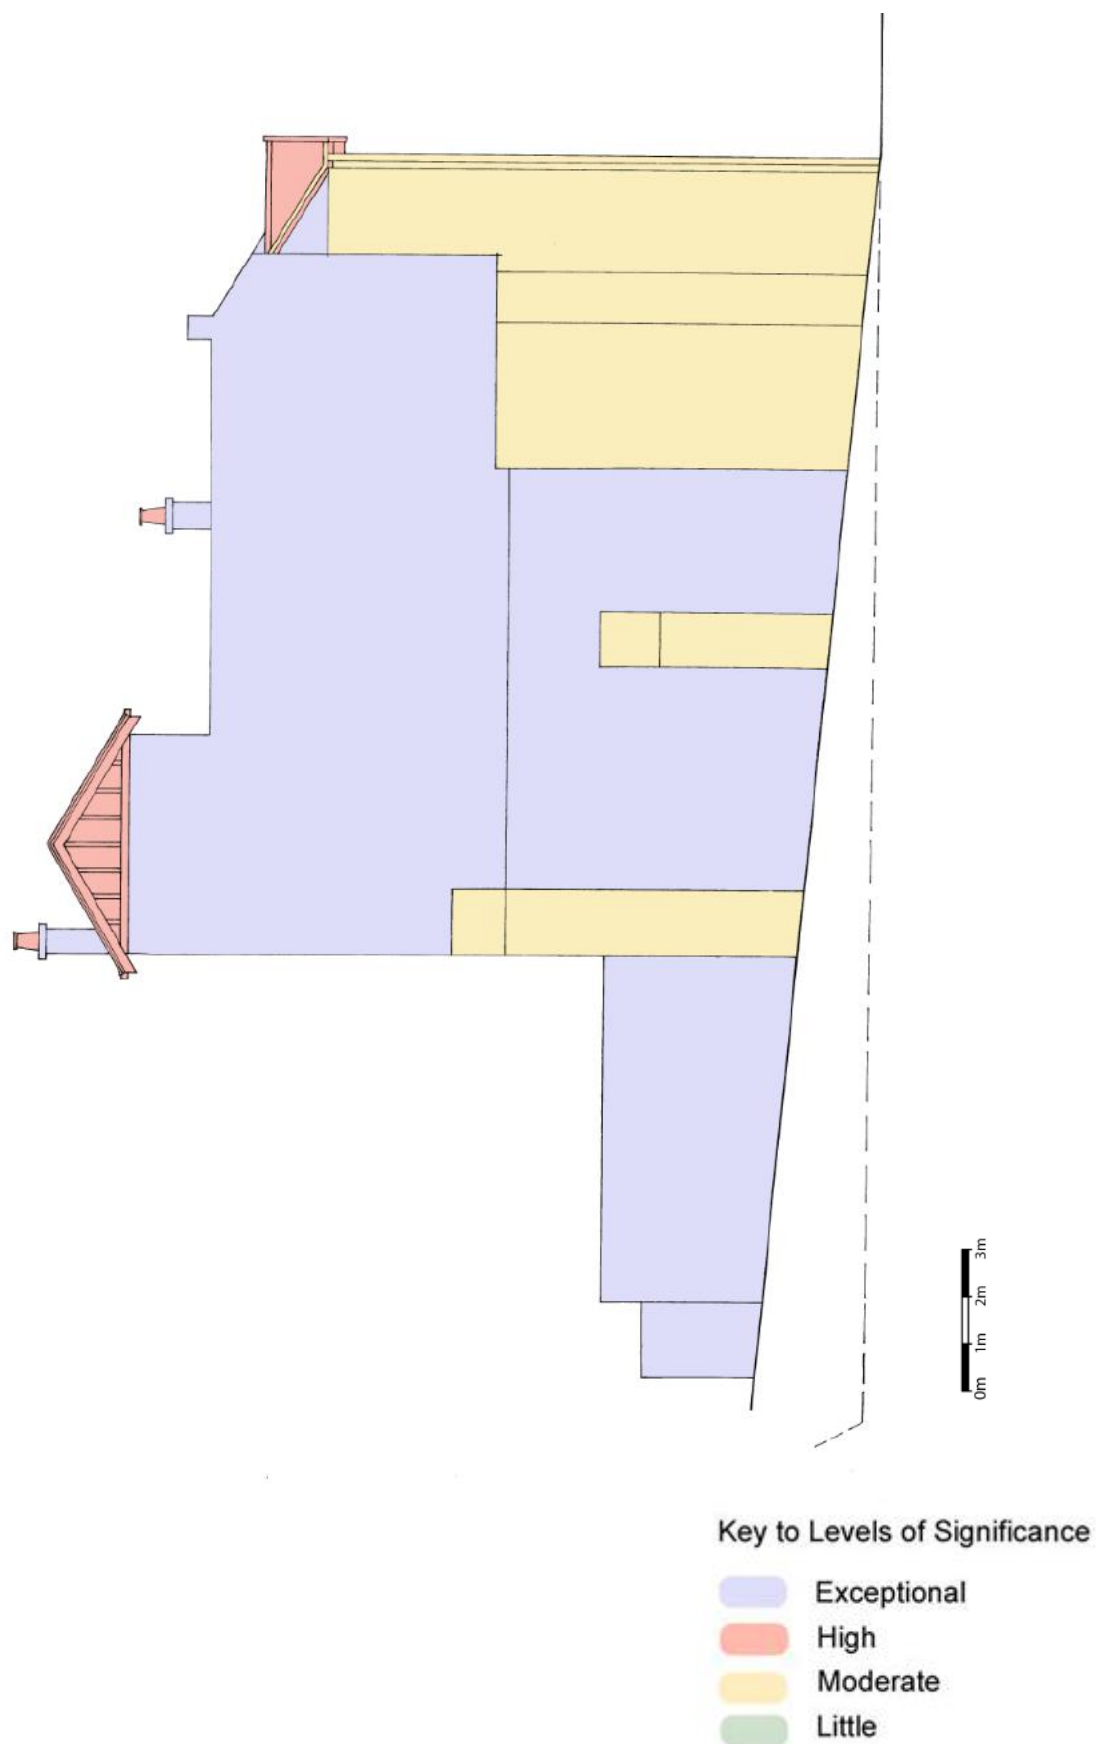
117-117A Gloucester Street – South elevation grading of significant elements and fabric
